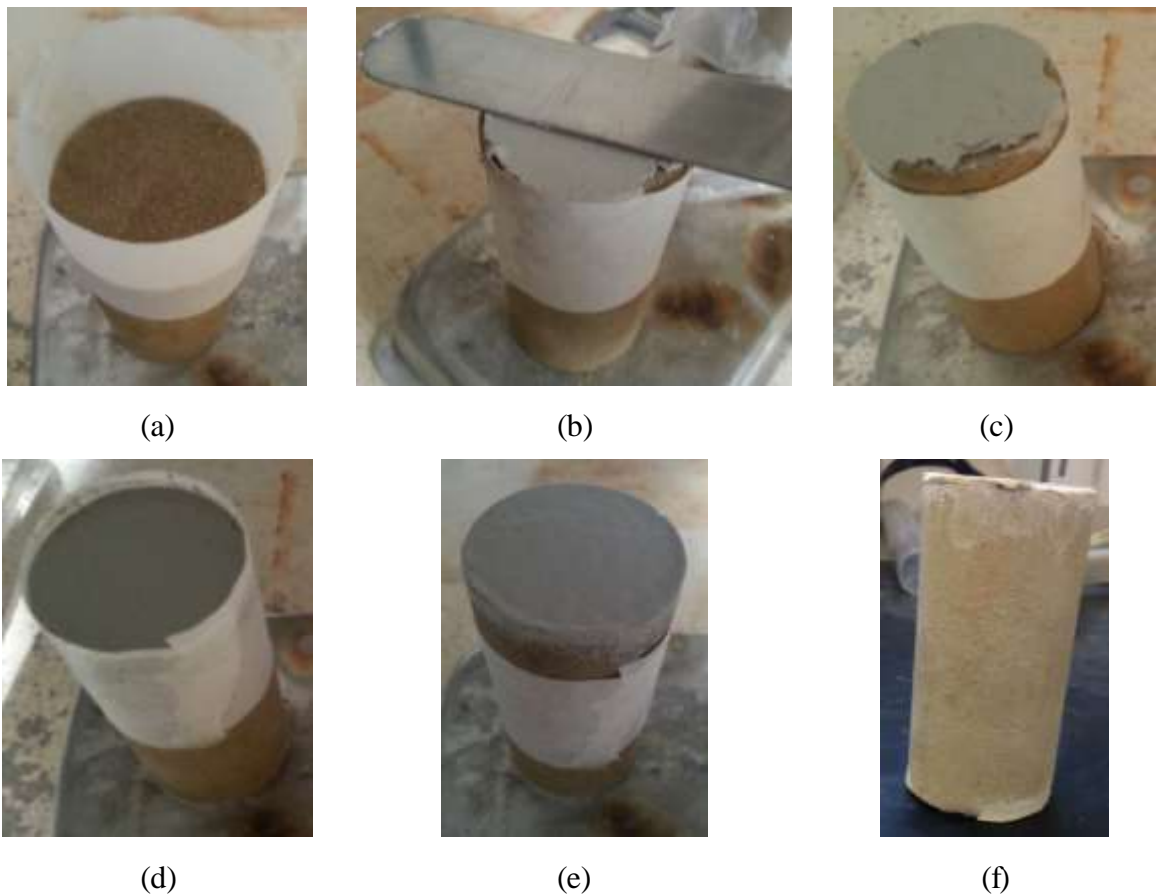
Capping of cylindrical specimens – (a) adhesive tape wrapped around the specimen; (b) capping mixture being levelled up; (c) finished top surface; (d) bottom of the specimen with the capping mixture; (e) finished bottom surface; (f) specimen prepared with the capping mixture on the top and bottom surfaces
